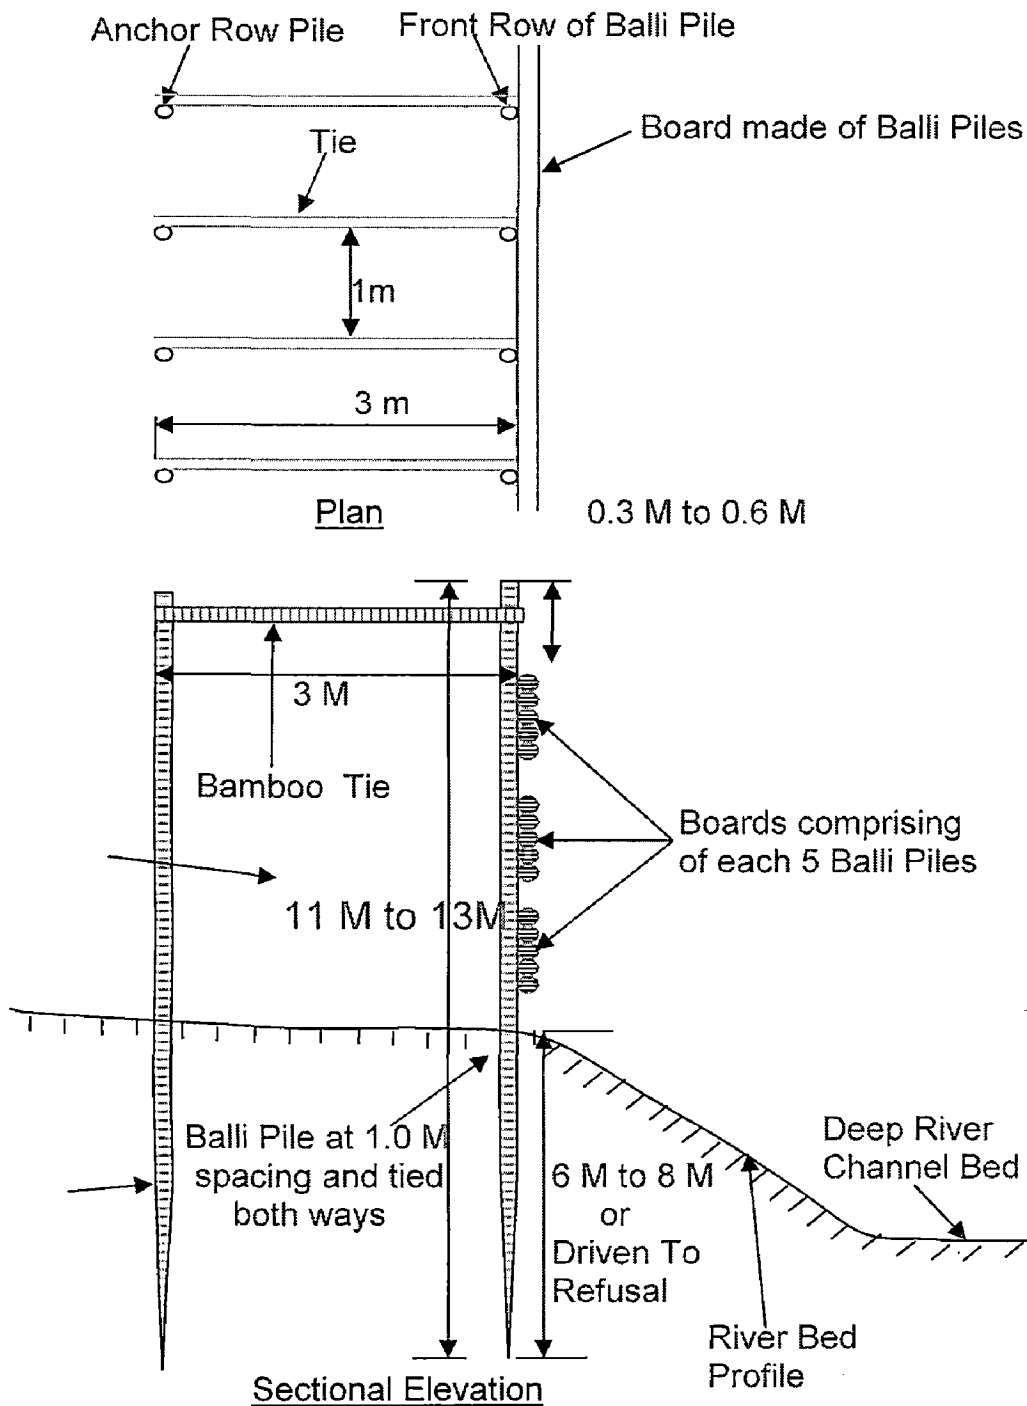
Typical Sketch Showing Bank Protection Works (Board Fencing)
